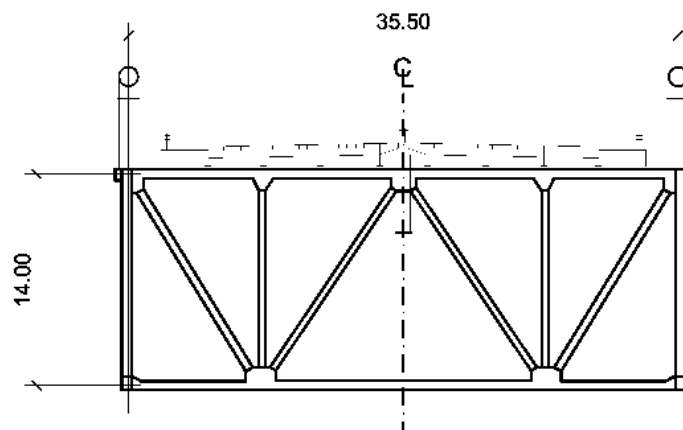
Cross section of the Akashi Kaikyo Bridge, Japan.
